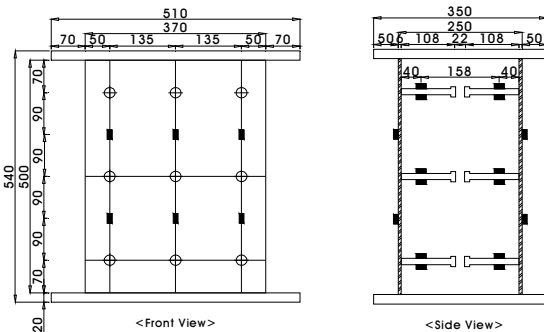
U.T.M .and Specimen(Specimen No.3)
